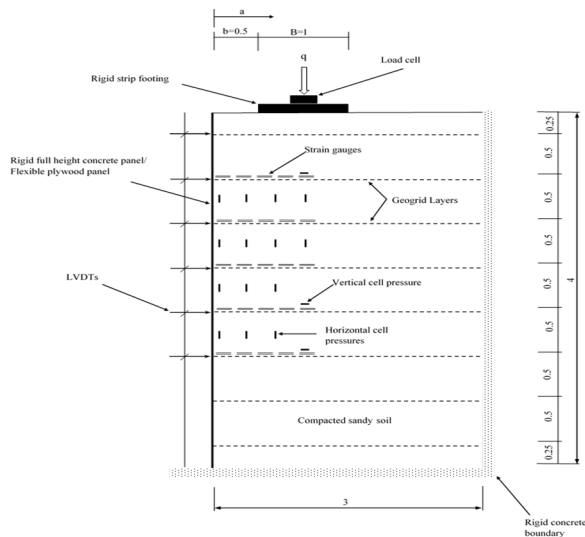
Test layout for full scale models and instruments (All dimensions are in m).
